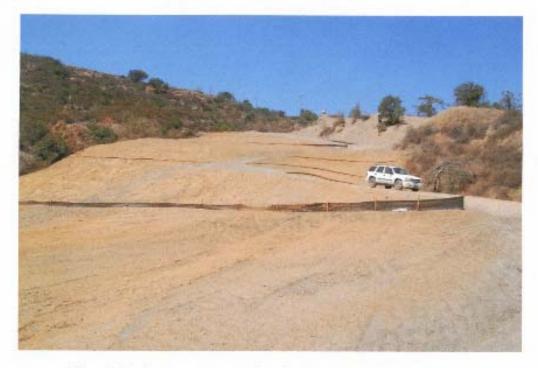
Erosion Protection on cut slope for the new access road to Flare #3
